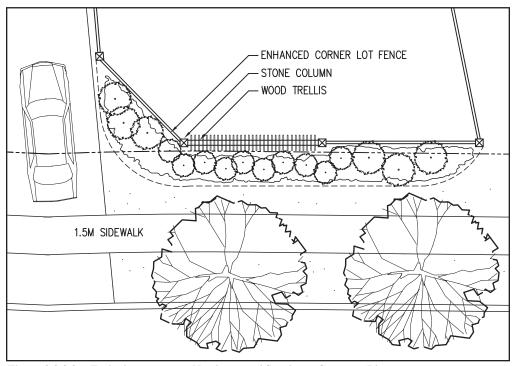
Typical treatment at Northeast and Southeast Corners - Plan
